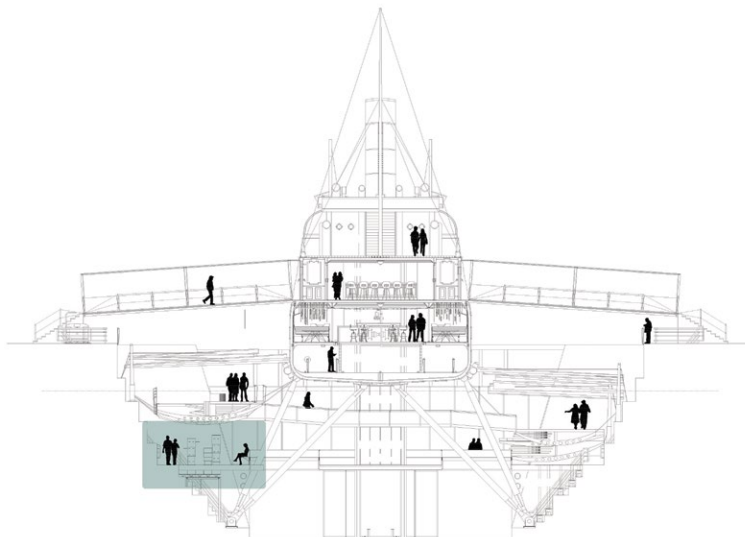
Final Proposed Stall Layout (Author, 2016)
